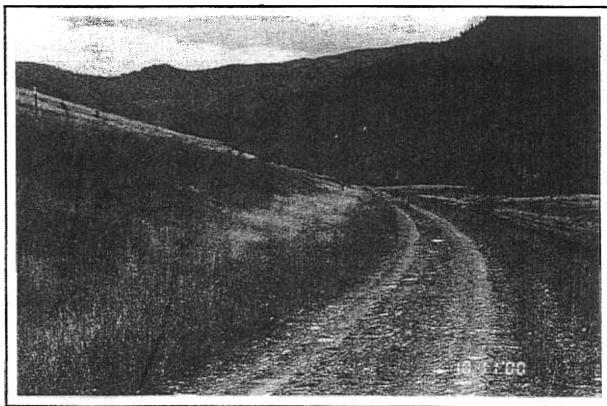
LOWER ACCESS ROAD LOOKING SOUTH. A PIEROMETER ON THE DOWNSTREAM SLOPE OF THE TAILINGS POND EMBANKMENT, A TOE POND AND A TOPSOIL DISPOSAL AREA ARE SHOWN.
